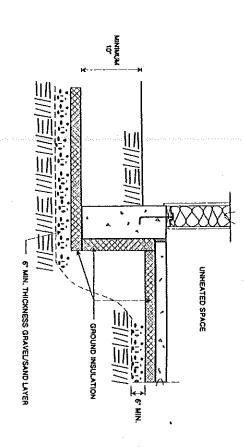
FPSF Design for Unheated Space with Independent Slab and Stem Wall.
